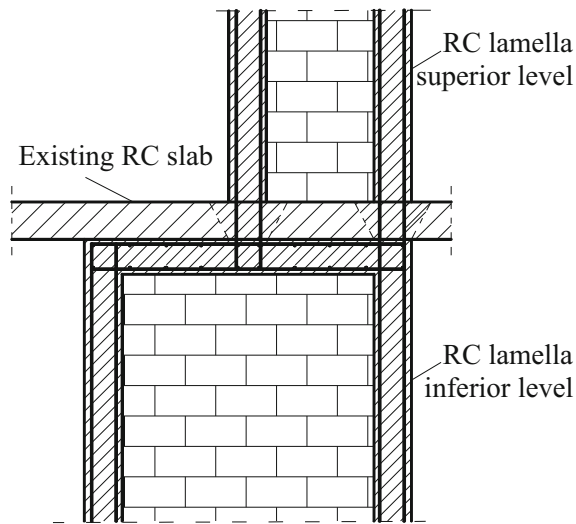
Strengthening solution of the masonry walls with additional RC elements [16]
